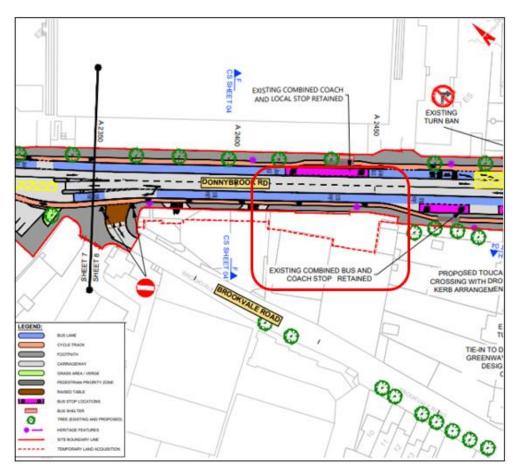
Extract from General Arrangement Drawings at Fast Fit in Donnybrook (Sheet 08)
